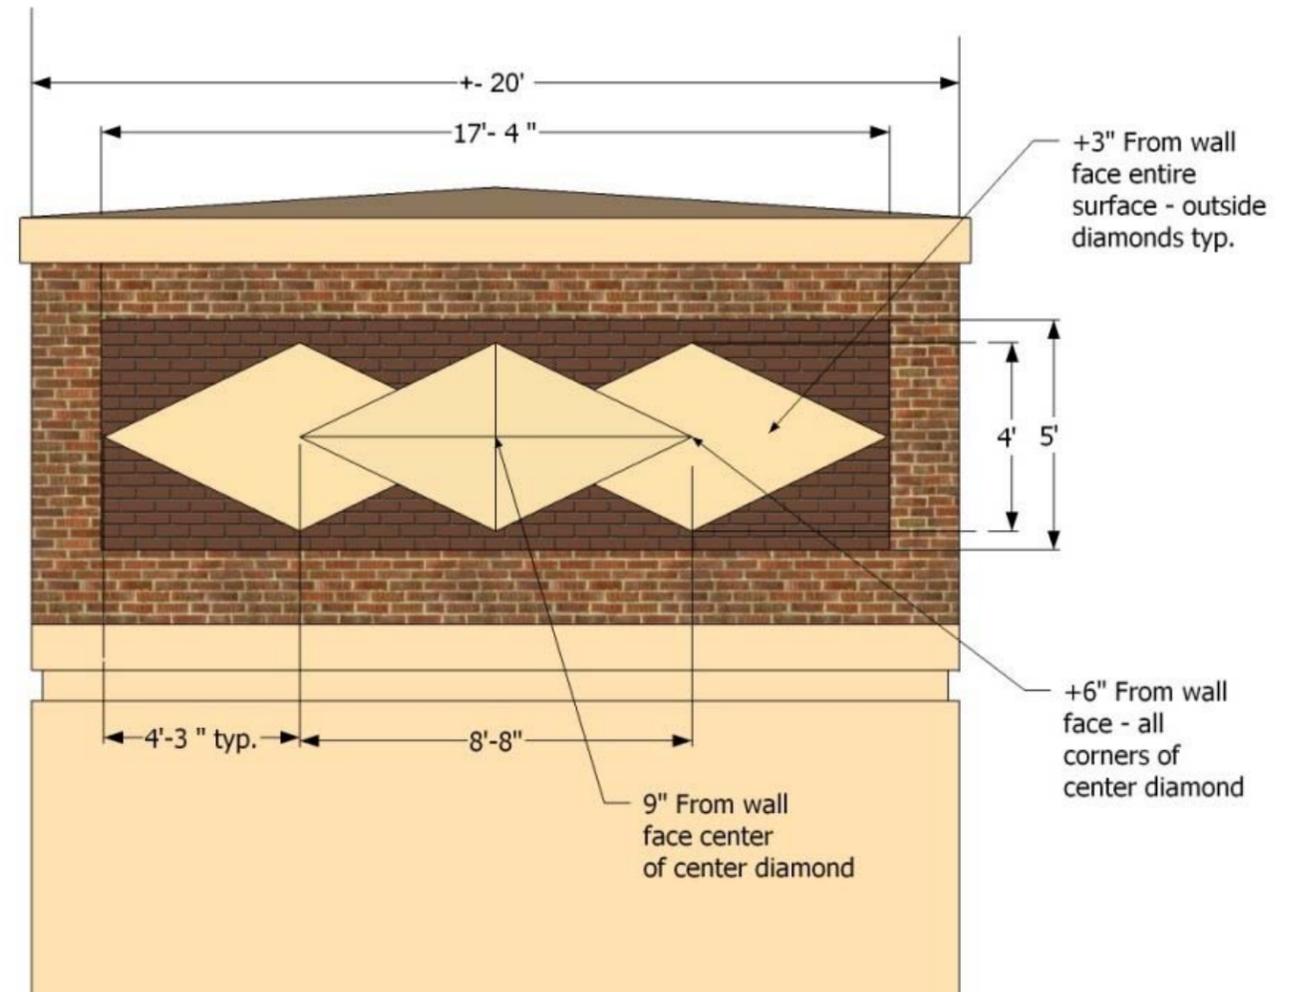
Partial Elevation View – Alternative Triple Diamond and Accent Brick
